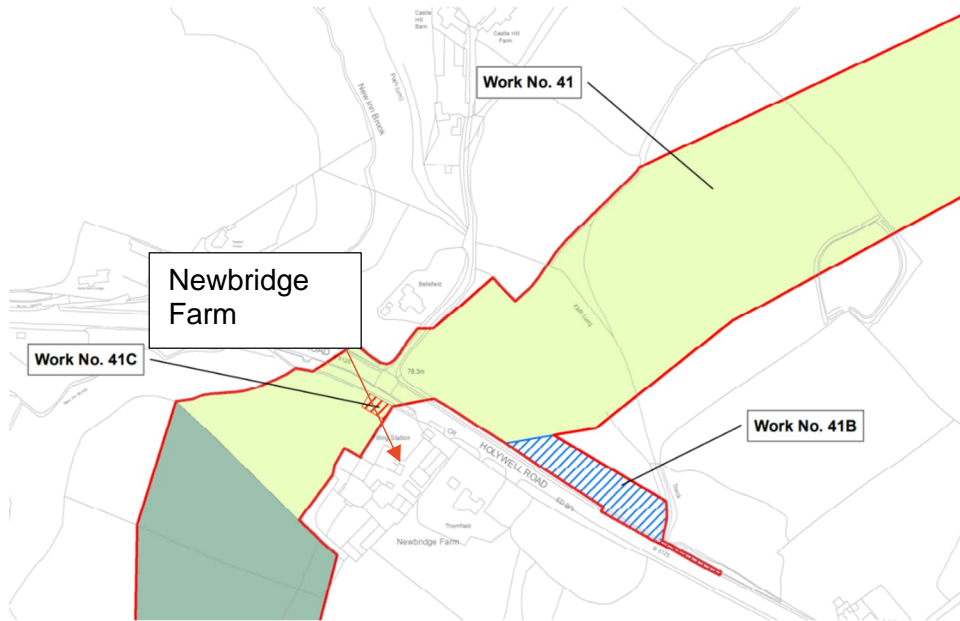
Extract from Works Plans (Rev G) [CR3-005] Sheet 18, Showing Work No.s 41, 41B and 41C
